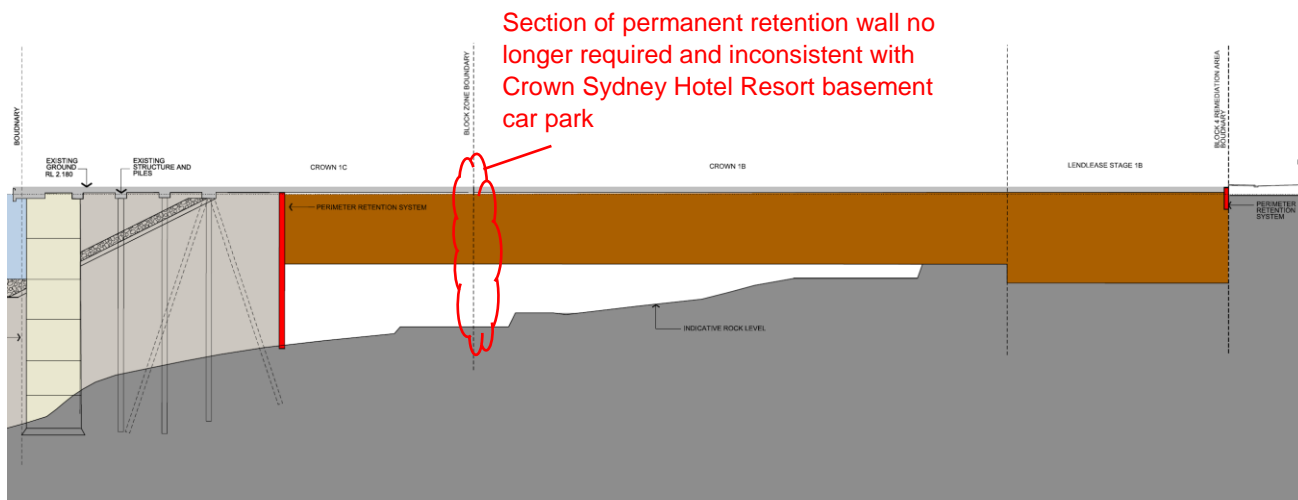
Block 4 perimeter retention wall (new Section 3 – through the removed section of wall)
